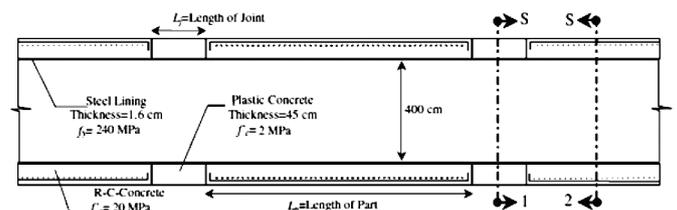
Schematic shape of concrete joints used in koohrang tunnel.
